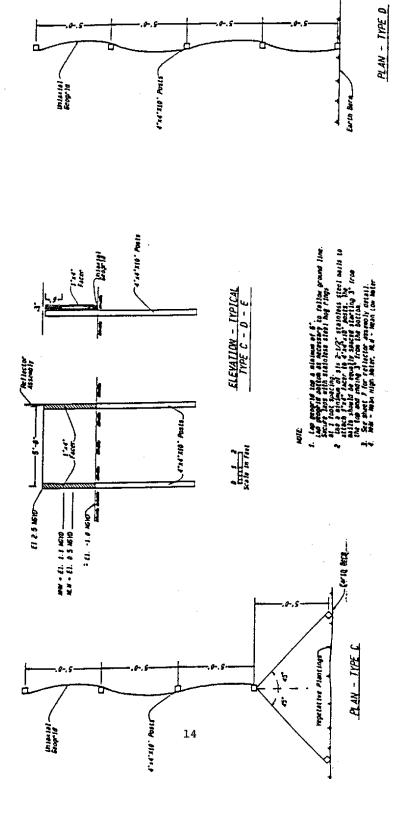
Design of Type C and Type D wave damping devices and reflector assembly.
